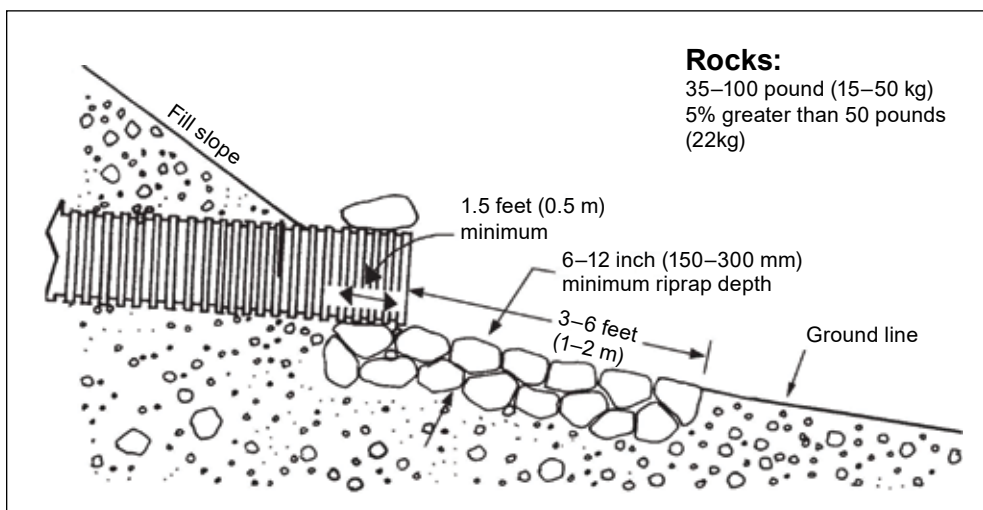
Detail of culvert-pipe outlet protection using small rock for riprap. (Figure from Keller and Sherar [2003])
